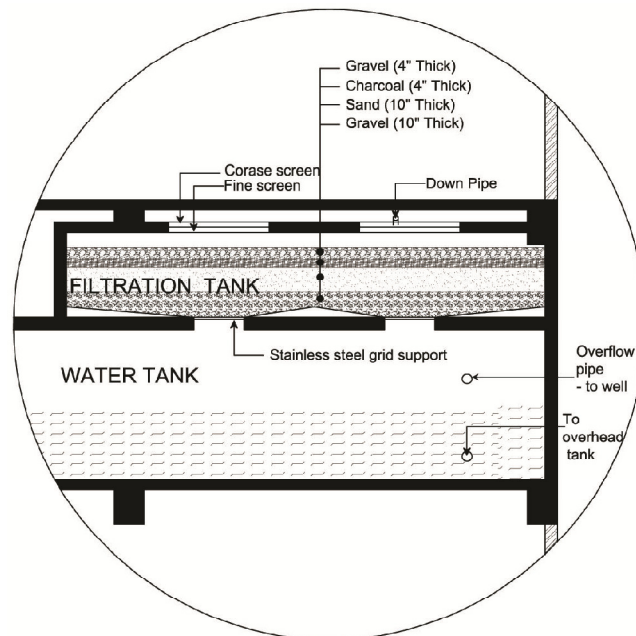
Section of rainwater tank on ninth floor (scale - 1:30)
